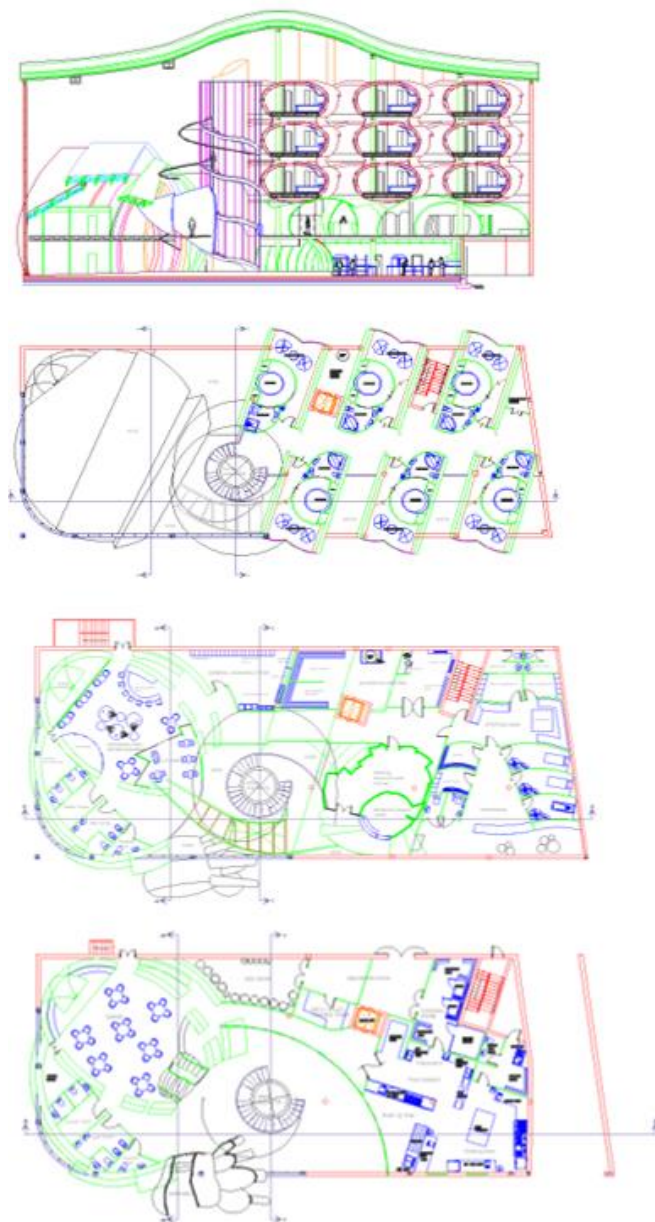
Hotel Project – Ground, first and second floor plans and section. (Source: student archive)
